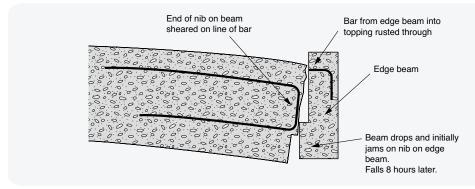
Precast connection with high sensitivity to building movement (adapted from IStructE (2010)).
